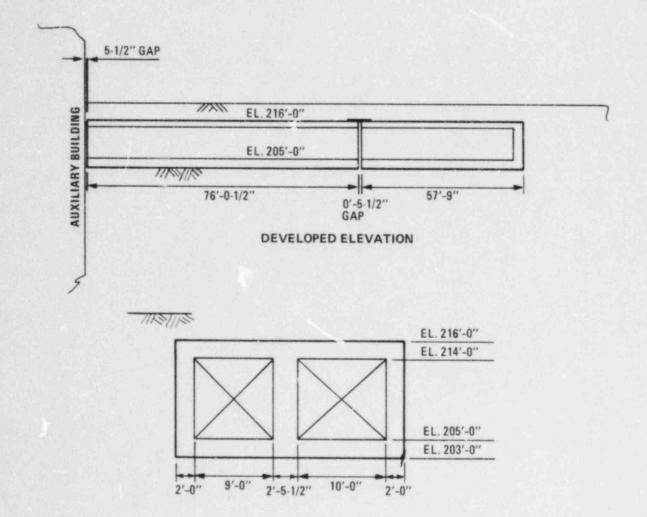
NSCW TUNNEL 1A DEVELOPED ELEVATION AND CROSS SECTION
